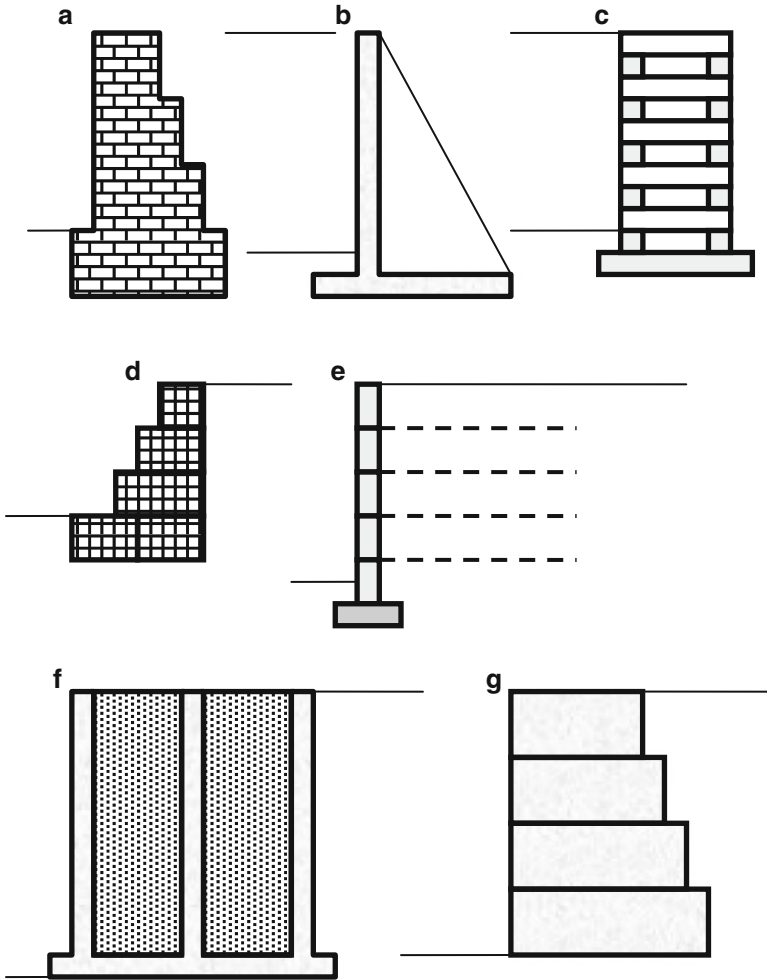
Sketches of cross sections of massive retaining walls (a) brick work, (b) reinforced concrete with counterforts that engage backfill mass (also called a cantilever or counterfort wall and is not treated as a massive wall), (c) crib, (d) gabion (metal mesh basket with rock fill), (e) reinforced soil with facing blocks, (f) caisson (or cellular cofferdam) filled with sand, (g) concrete blocks
